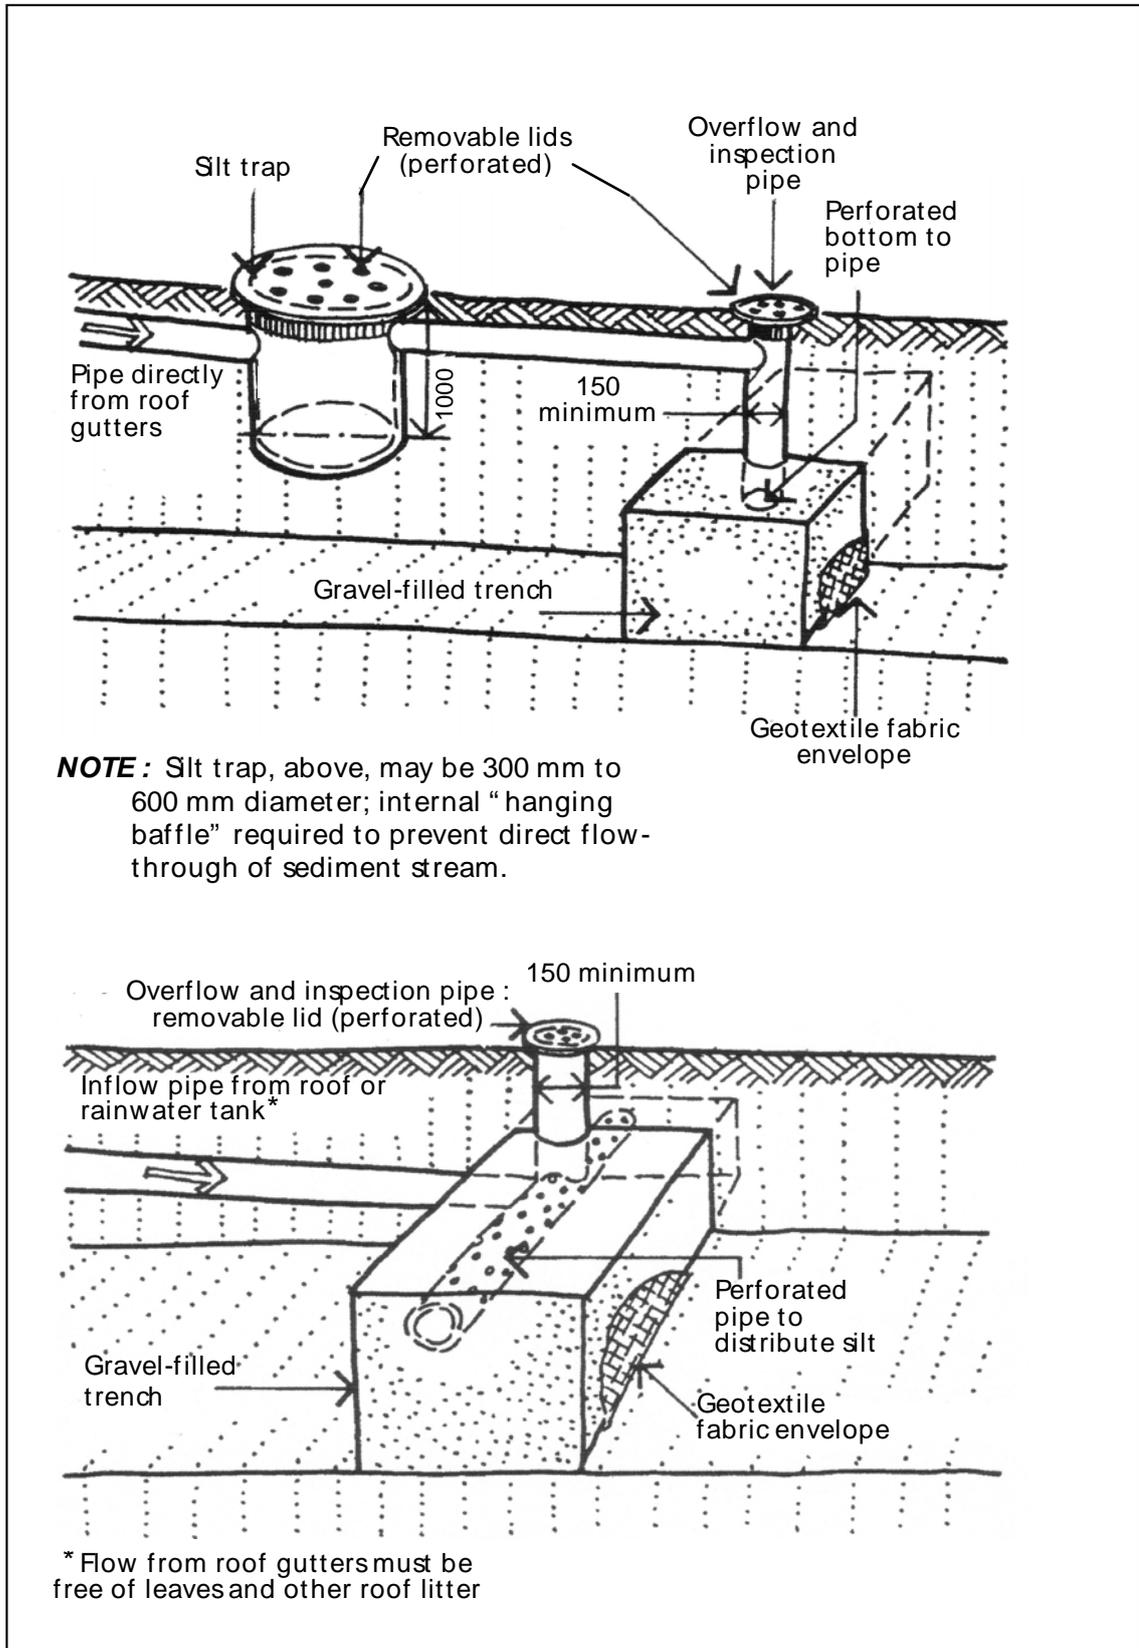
Details of sediment management systems for roof (only) flows to gravel-filled trenches
